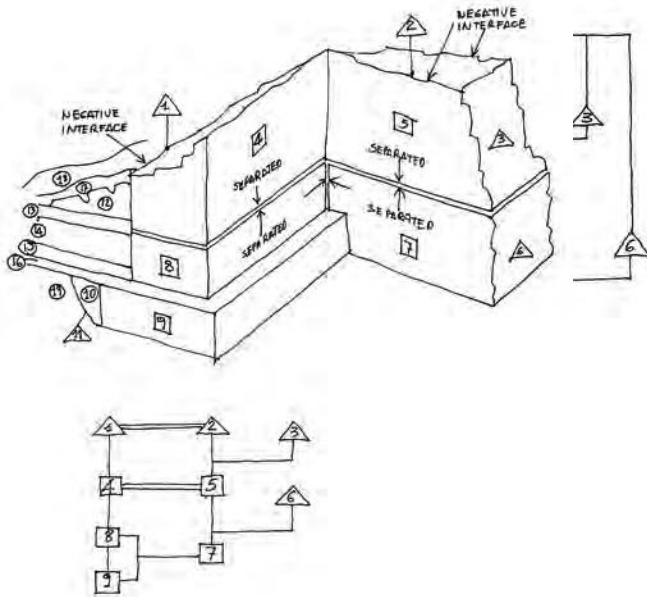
A combination of wall structures and foundations illustrated by their structural and stratigraphical matrices.
